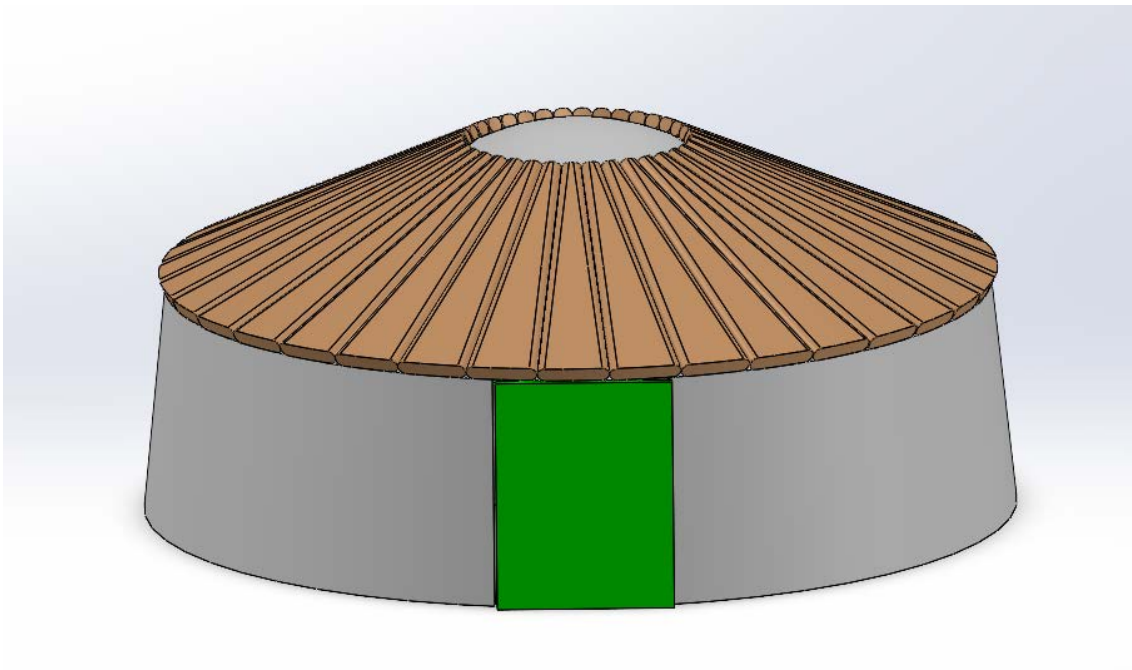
Constructed design of the roof insulation in SOLIDWORKS
